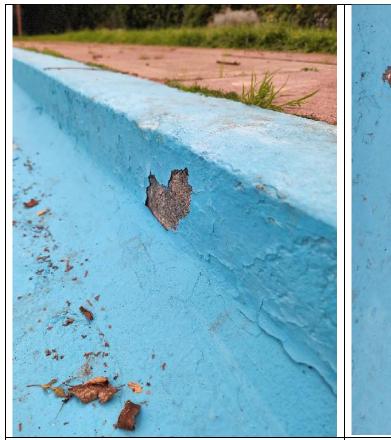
1 isolated paint delamination to the upstand wall of the pool tank
